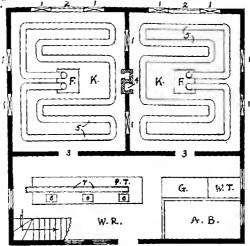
Fig. I .- Two-kiln Evaporator, Ground Floor Plan.
